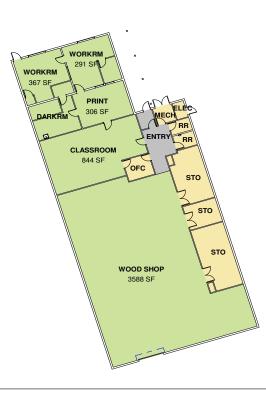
Cimarron High School Facility Utilization Plan
